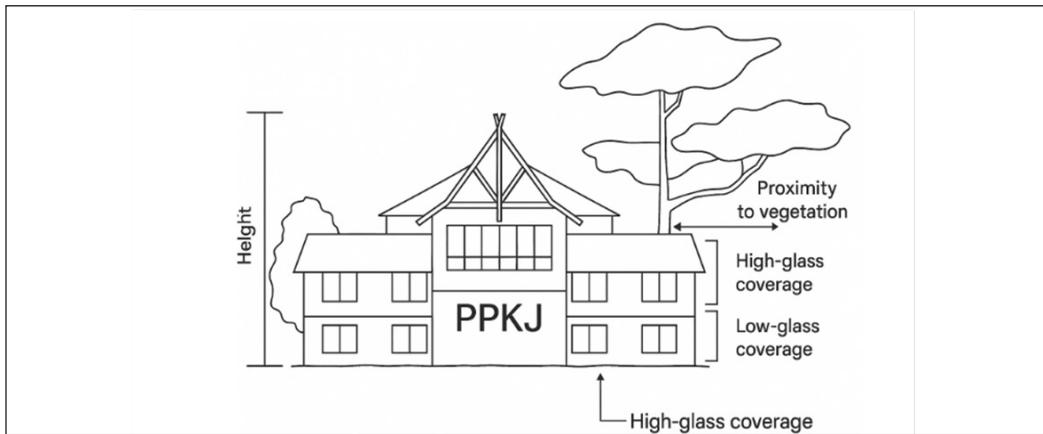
Building elevation sketch showing window coverage and surrounding vegetation
